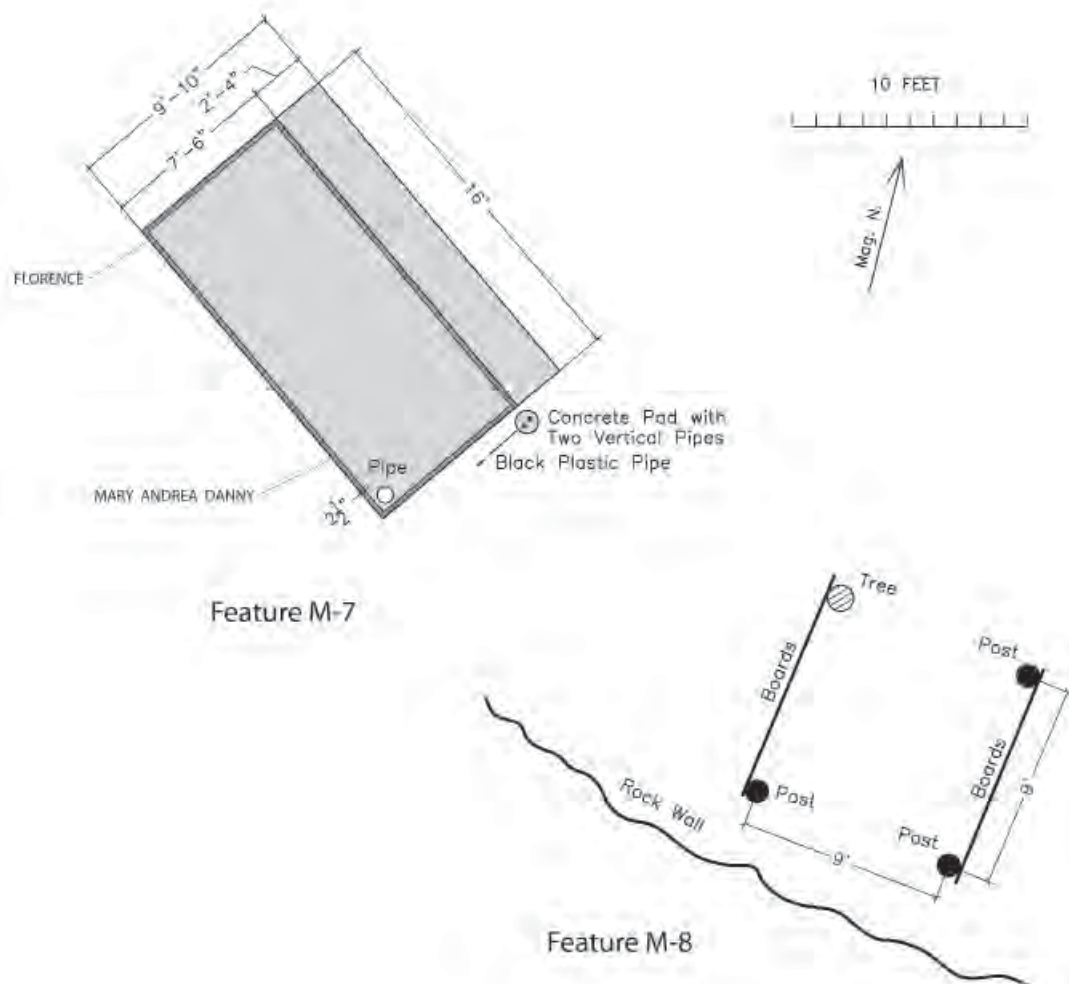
Feature M-7 and M-8, concrete slab and loading pen.
